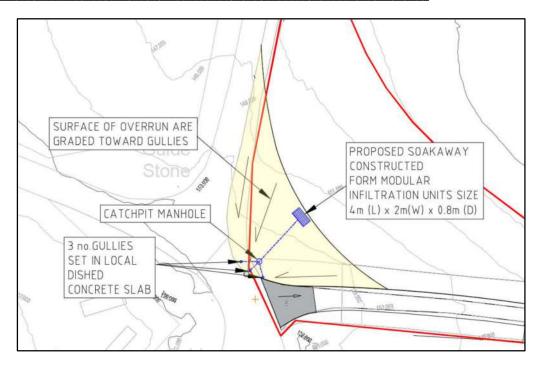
Plan showing Proposed Drainage Works in Overrun Area
